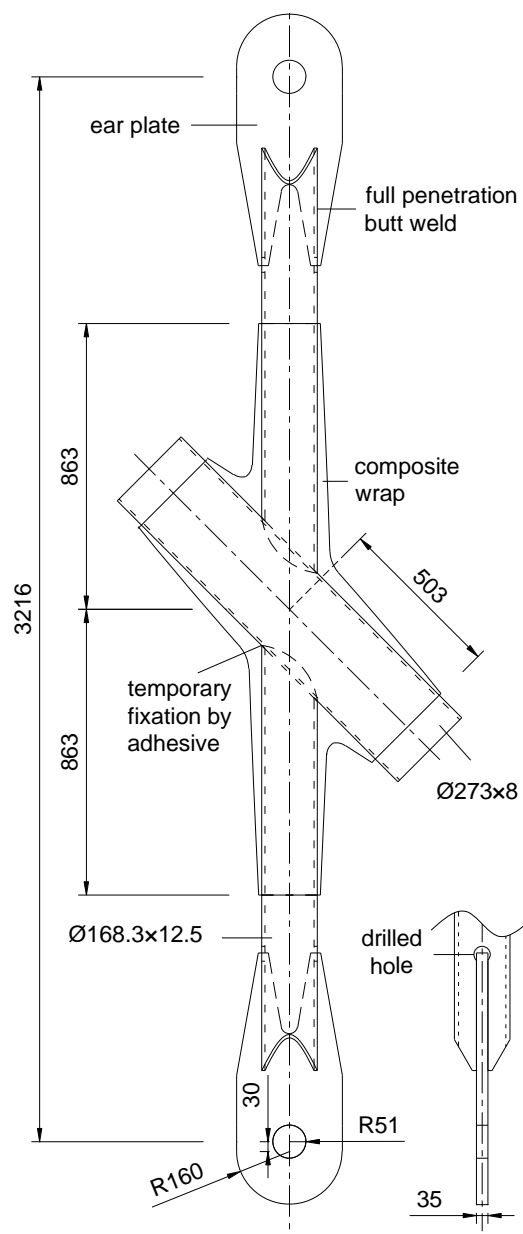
Geometry and dimensions of specimen (in millimetres)
